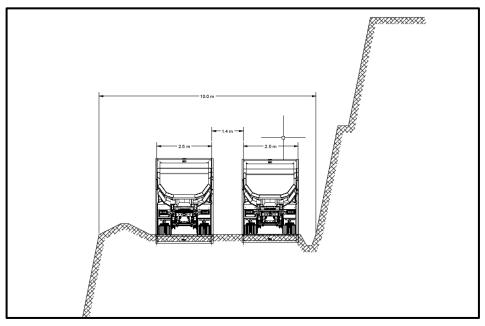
Main Ramp Section Showing Two-way Traffic, Safety Berm and Bench Slopes
